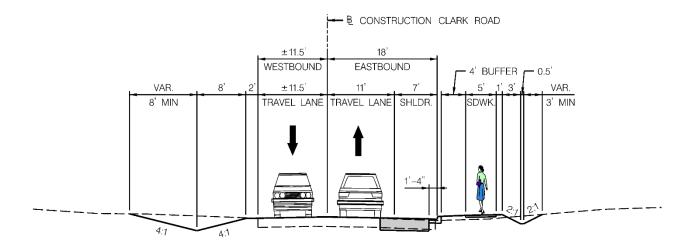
ALTERNATIVE 1 TYPICAL SECTION
